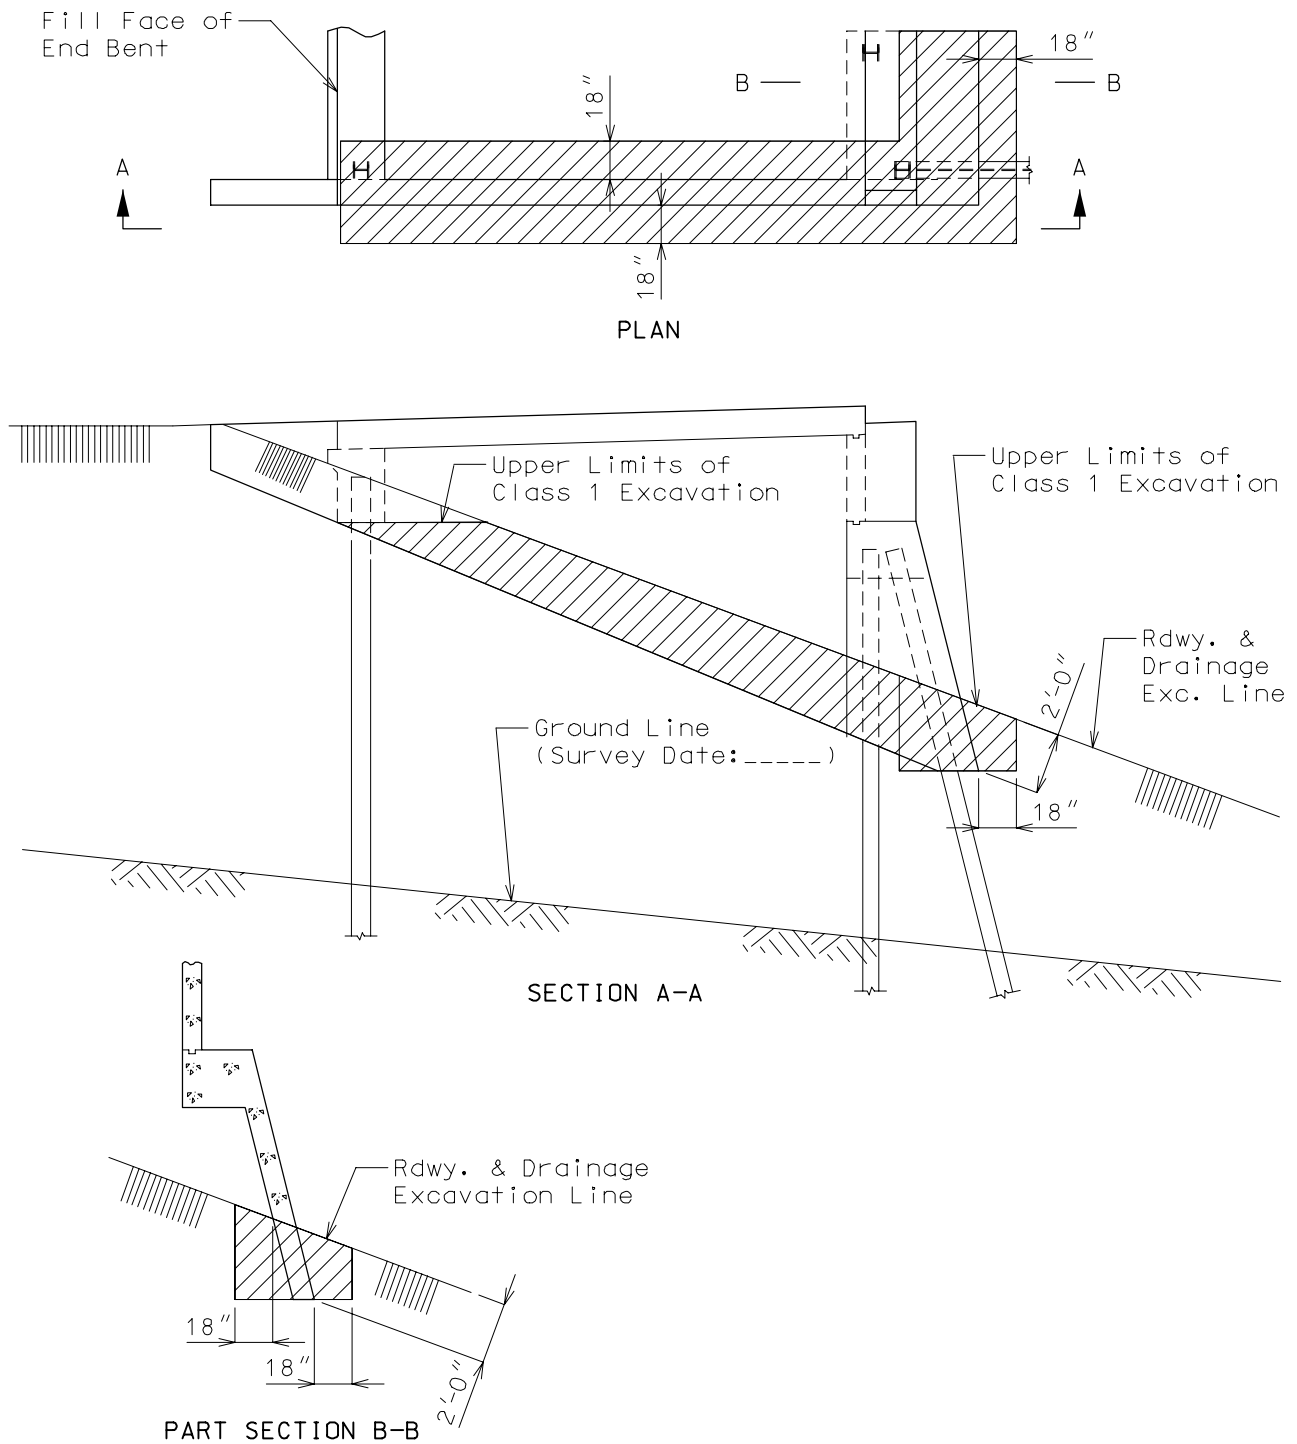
Semi-Deep Abutment Excavation Limits (Case 2 *)
